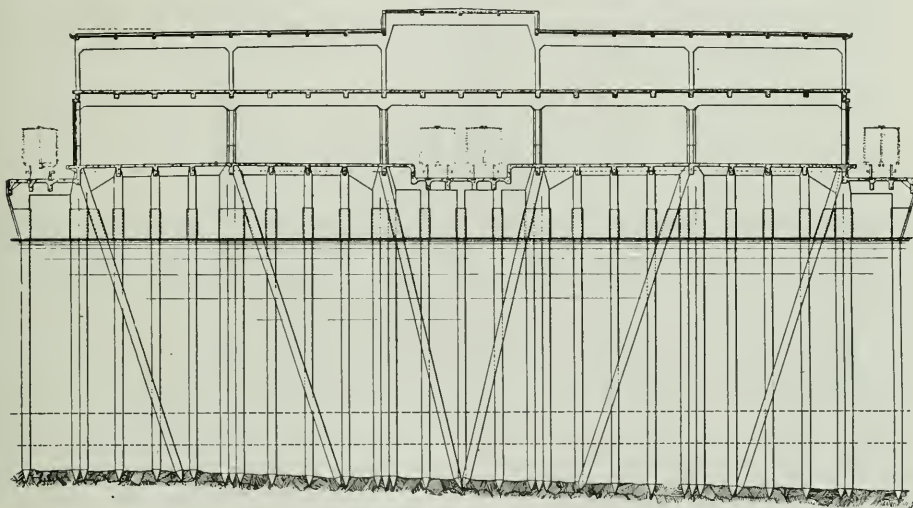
Transverse Half-Section of Pier, Showing Arrangement of Brace Piles.
